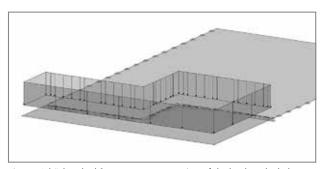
Schöck Isokorb® T type K-E, K-T: 3D view of the load on the balcony; left and right slab support restrained
